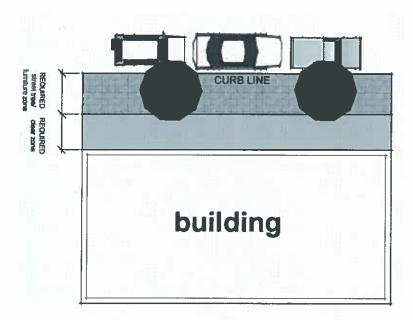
On-street parallel parking - standard design adjacent to the curb.
